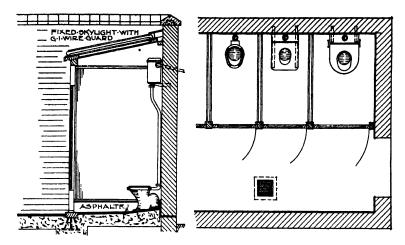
Enlarged part plan of Fig. 90, and section showing details of construction of water-closets.
